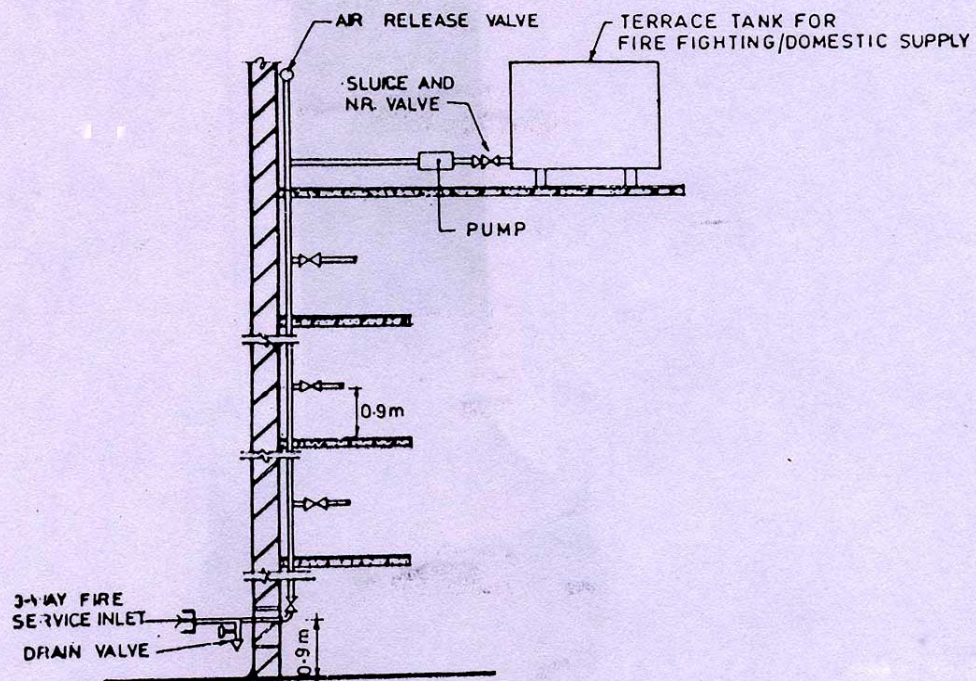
Typical Arrangement of Down-comer for Building above 15 m but not Exceeding 30 m in Height
